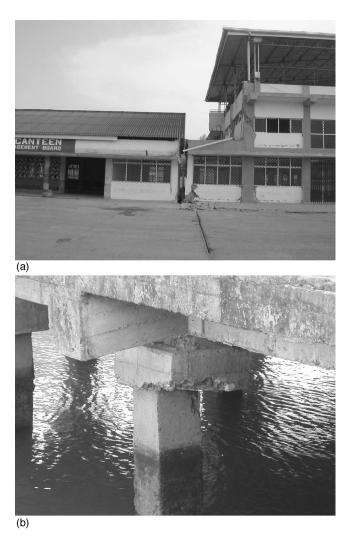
(a) Foundation (RC piles) settlement/failure resulted in settlement of the passenger terminal building at Haddo Wharf. (b) Dislocation of a pile cap in an RC storage building at Haddo Wharf (photos: H. Kaushik).
